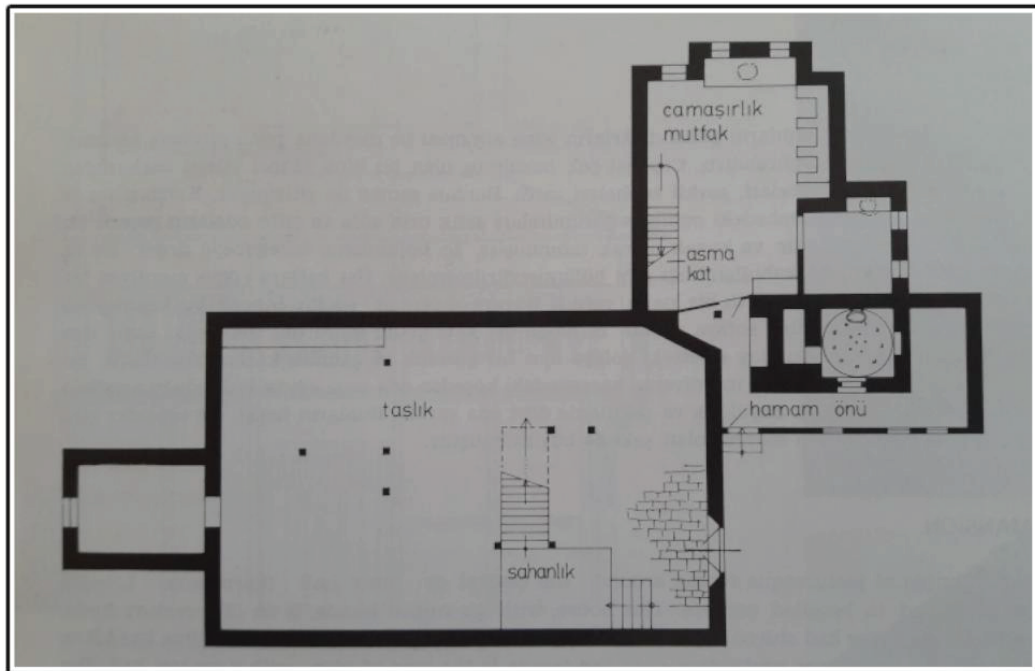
Ground floor plan of Izmit Fazıl Pasha Mansion.(Source: Eldem 1984, p.154)
